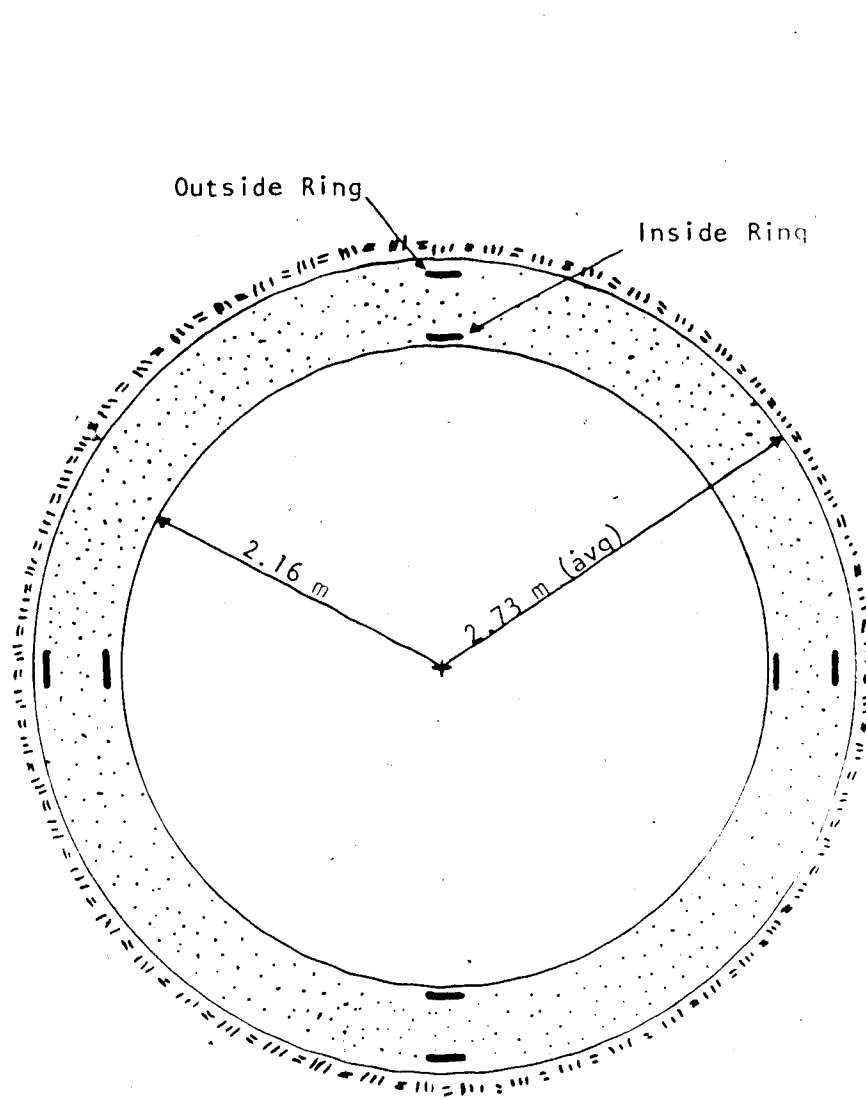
Plan View of Embedment Gauges at 108 and 109 m Depth
